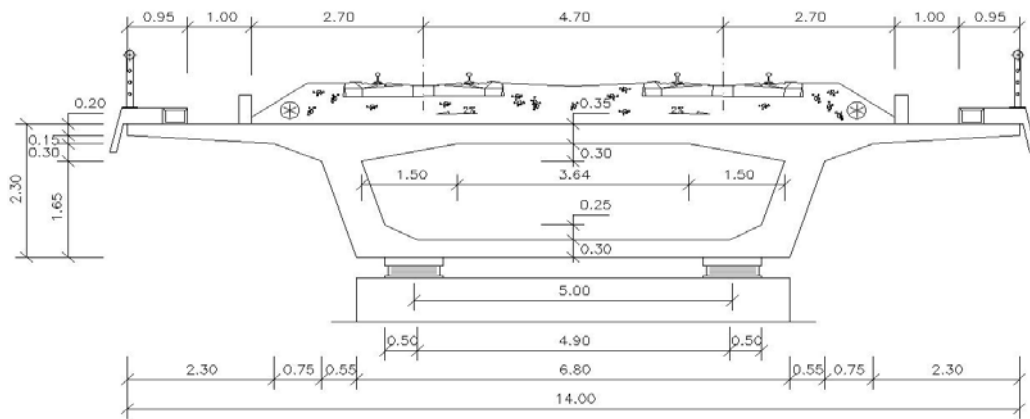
Deck-section considered for the 40 m span railway viaducts
